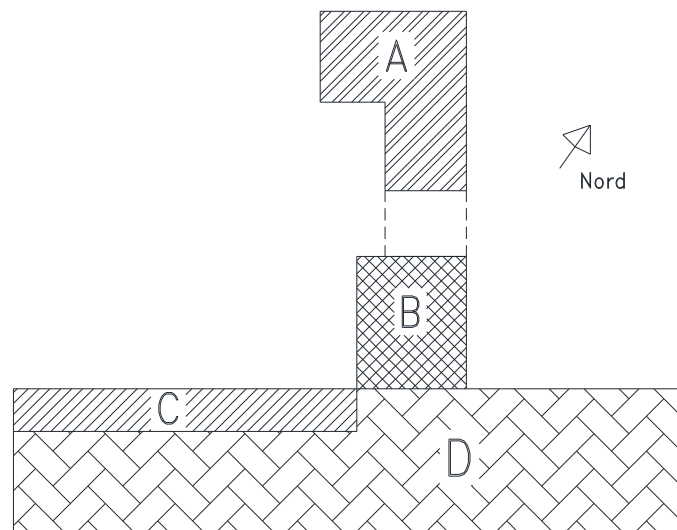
Plan layout of the San Bartolomeo Eustachio Hospital.
